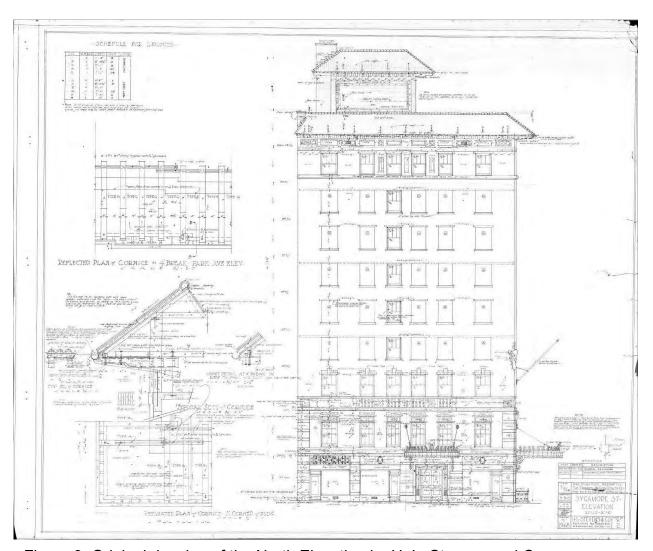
Original drawing of the North Elevation by H. L. Stevens and Company, 1928. From the collection of the building's owner, available in the management office, Park Towers Apartments, Waterloo, Iowa.
